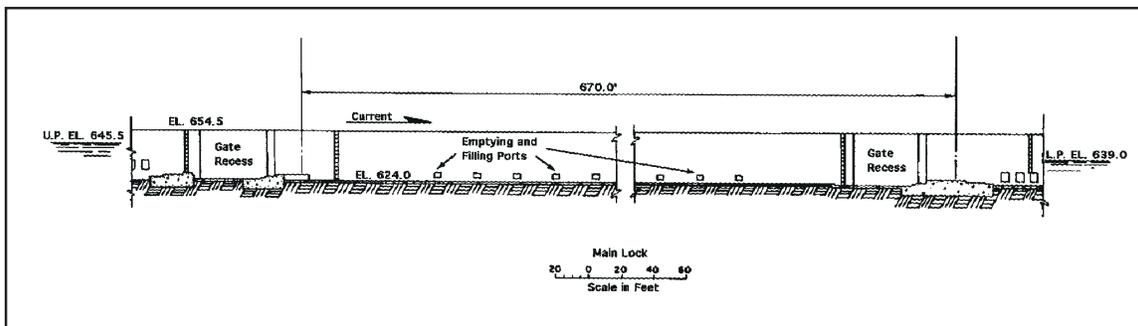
Cross sections of Lock and Dam 6 depicting the intake and emptying ports where zebra mussels were collected
